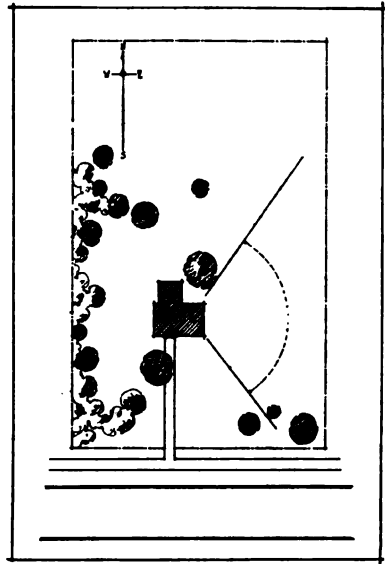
Planting plan to insure best effect of shade, outlook, protection, and privacy on a lot facing south
